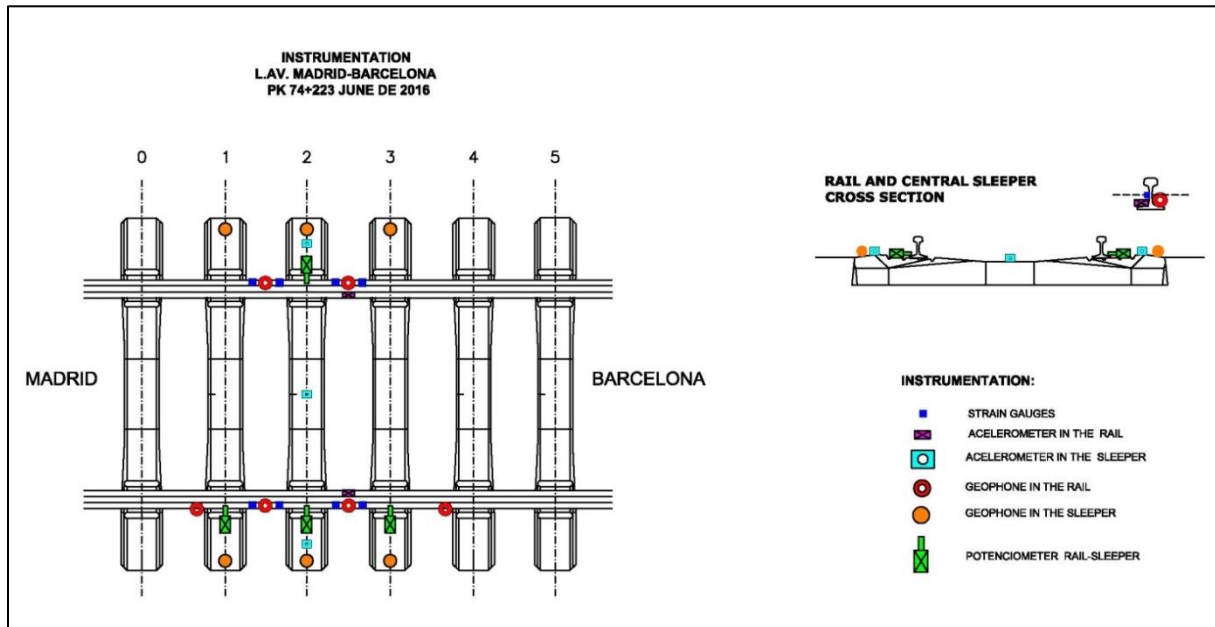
SKETCH OF THE INSTRUMENTED SECTION
